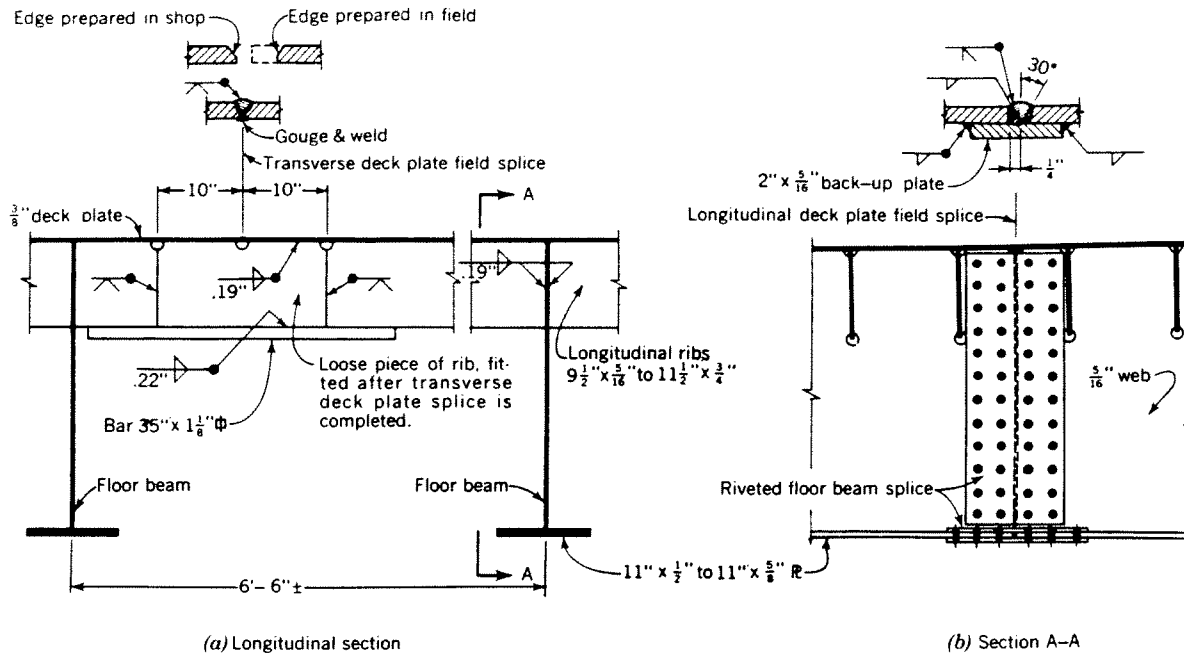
Deck splice details, Severin Bridge [63, 69], see Fig. 1.17
